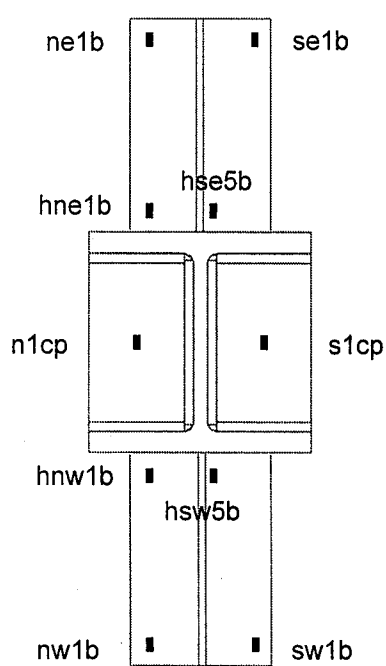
Section H-H: Strain Gages of Top of Bottom Girder Flanges
